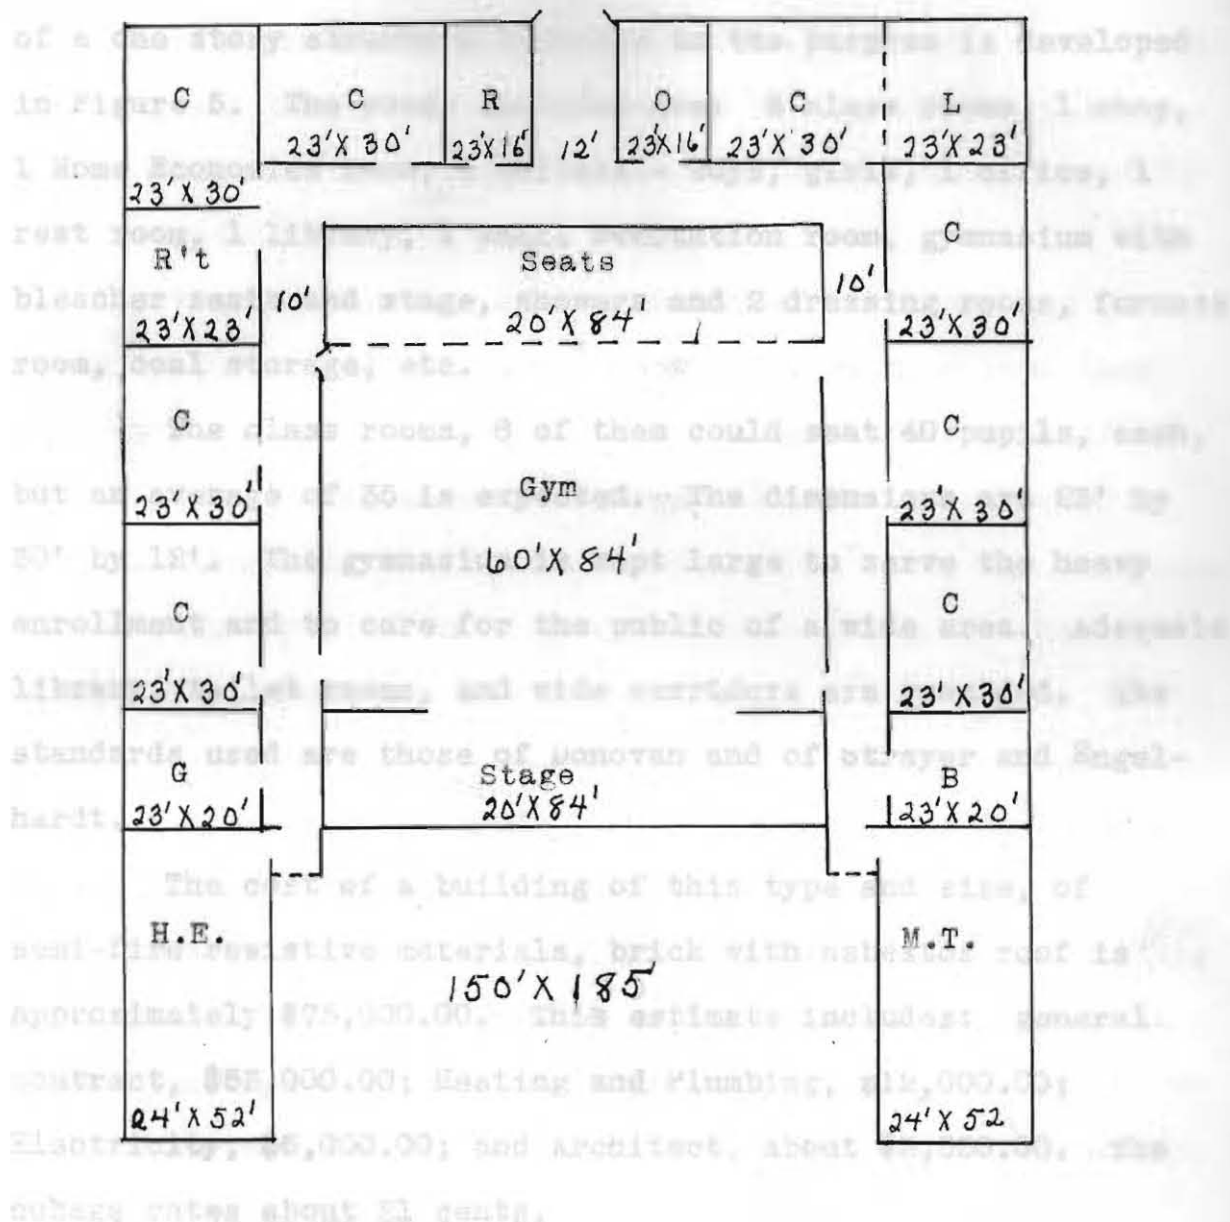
General Layout of Main Floor of A Suggested One Story Type of Elementary School Building
